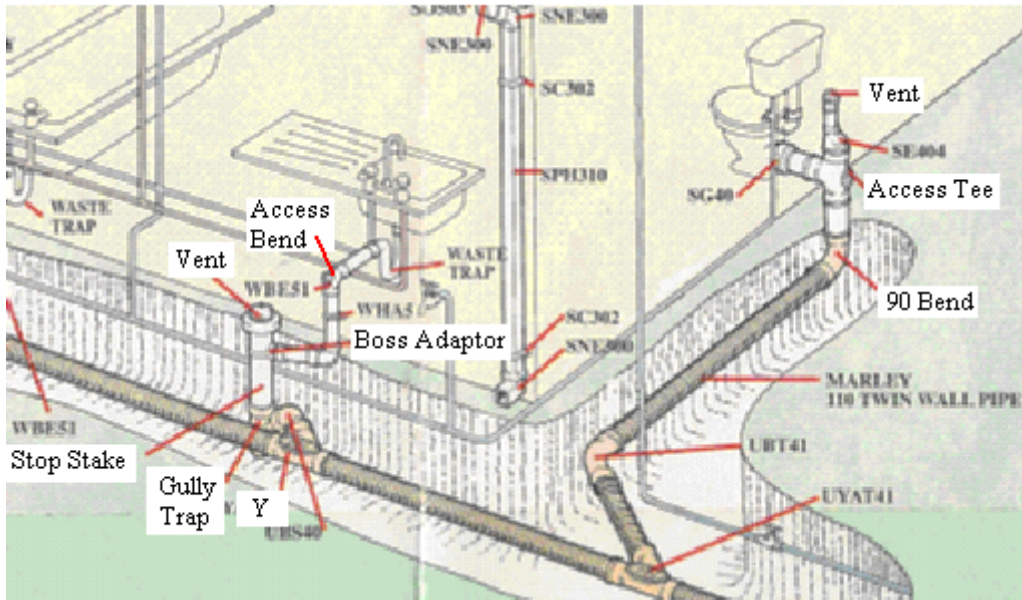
Common household underground piping (Marley Plumbing Systems, 1999)
